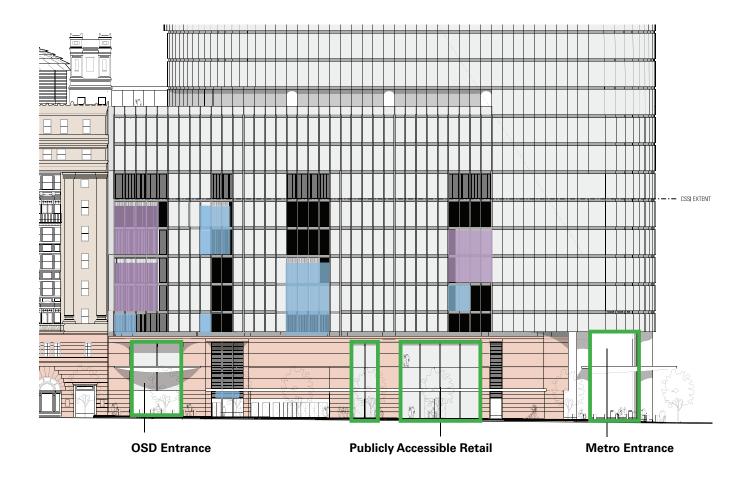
Elizabeth Street - Diagram of active street frontags and vertically stacked ventilation outlets located above granite base
